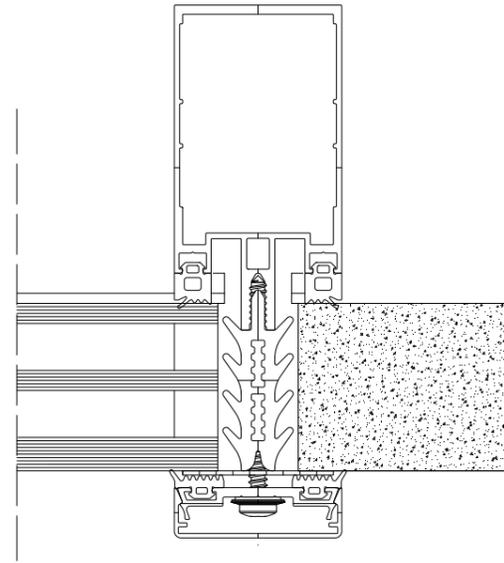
Detail of a curtain wall system with regular triple glazing on the left and a hybrid facade panel on the right.
